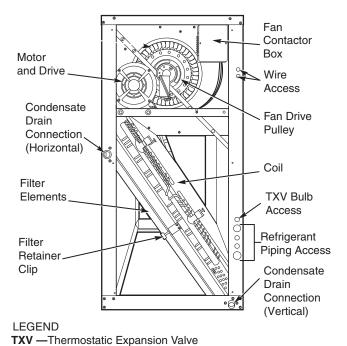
Wiring and Service Access (Side Panel Removed)
